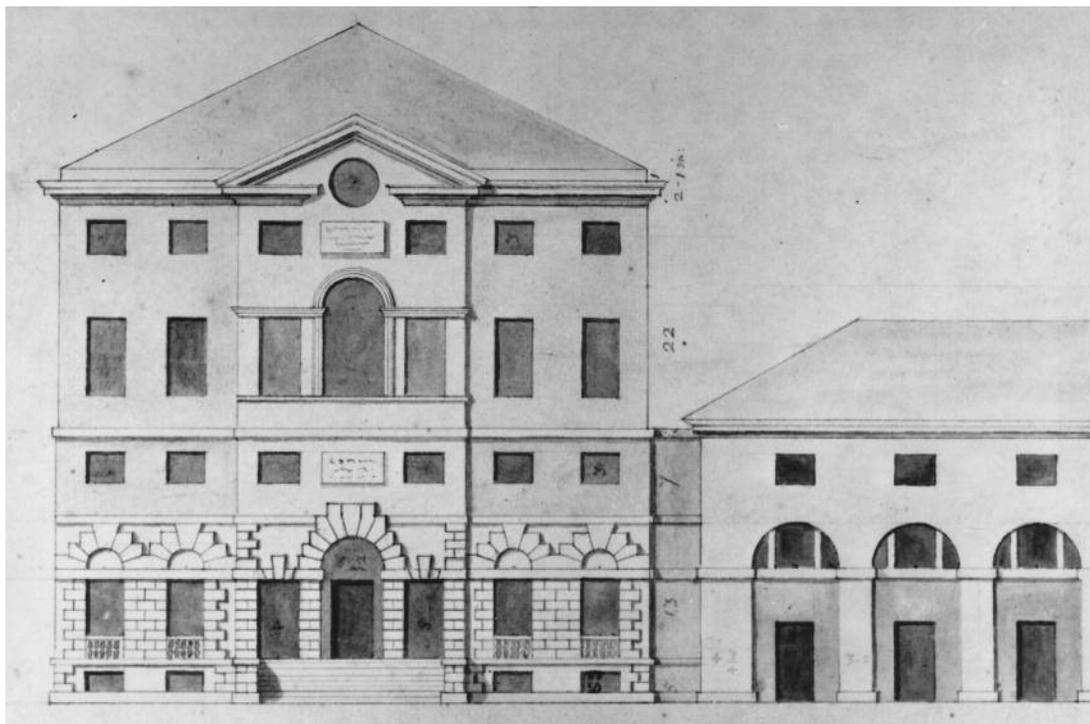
Lord Burlington, west elevation of proposed school house and part of almshouses. *RIBA*.
